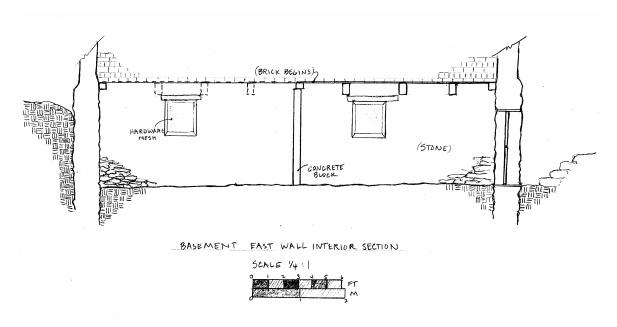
Basement east wall elevation drawing showing stone foundation, windows, and exterior door on the southern wall.
